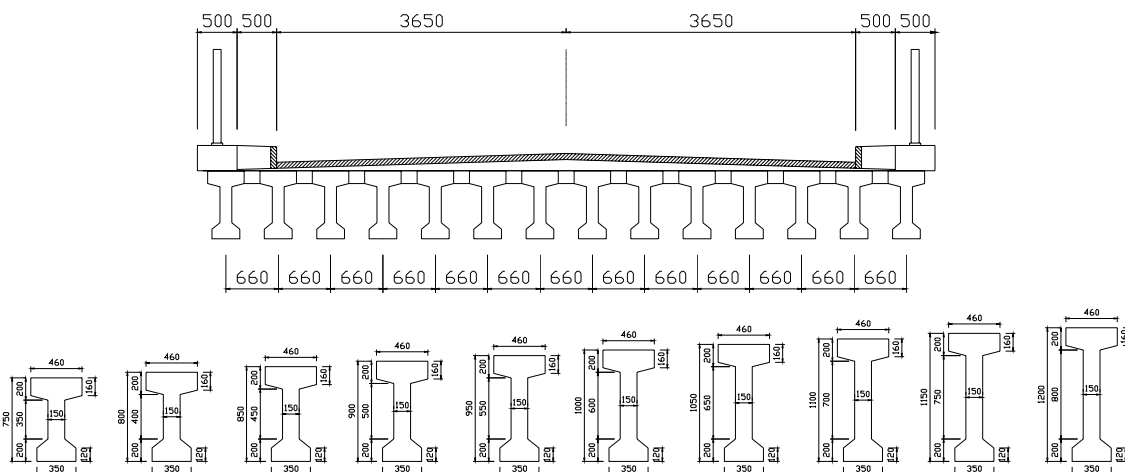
Typical two lanes girder bridge of T-shape with heavy bottom flange (14 girders)
